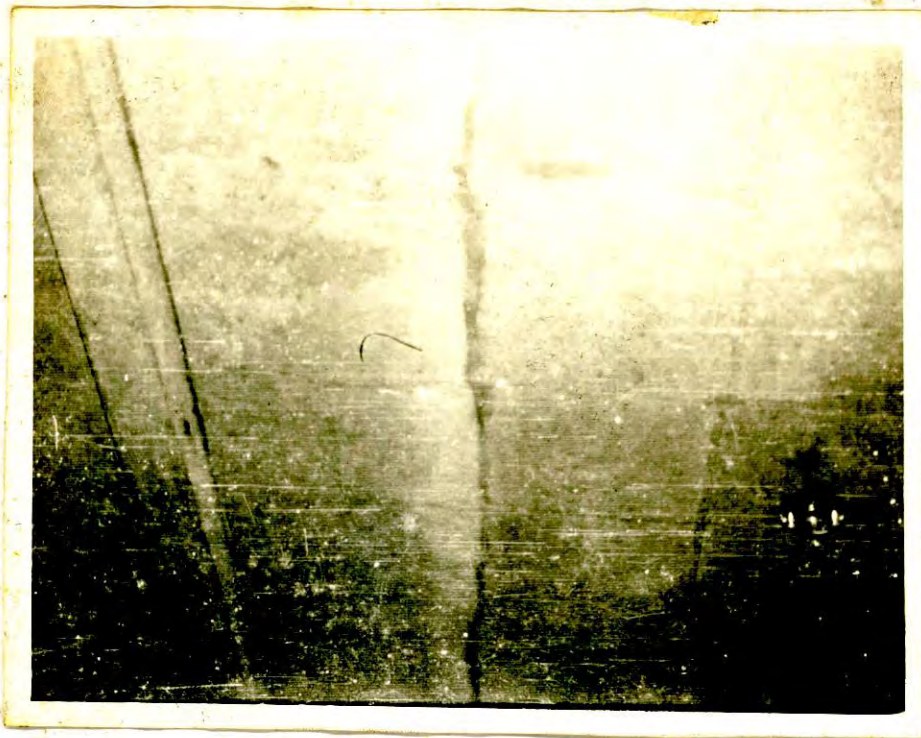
Cracks in roof slab in Feni godown.
